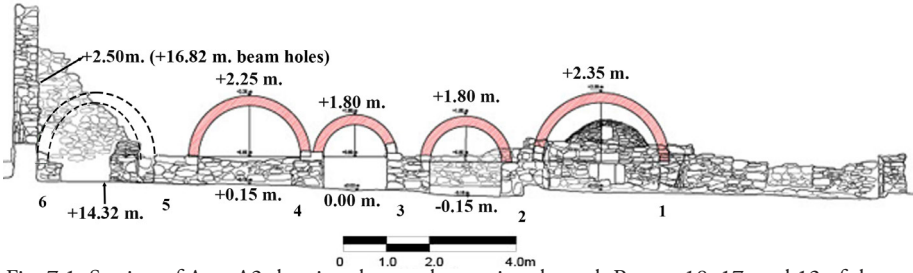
Section of Area A2 showing the arcade running through Rooms 18, 17, and 12 of the building, together with the inferred height of the arches.
